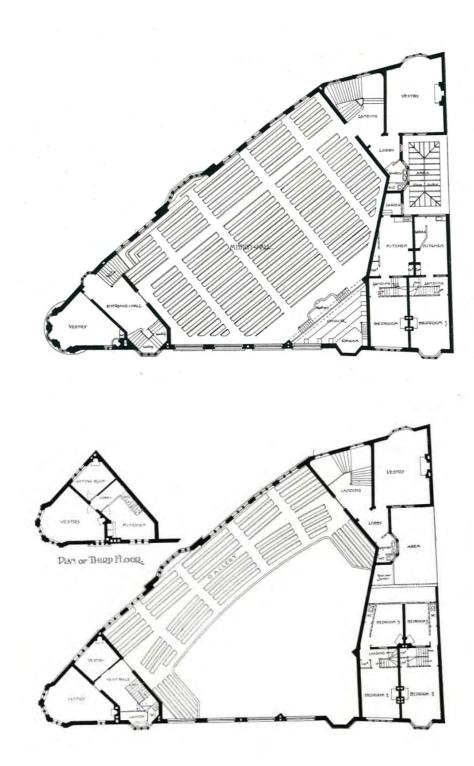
Top to Bottom: First and Second Floor Plans of Westgate Hall in Newcastle by Crouch and Butler. Source: Crouch and Butler (1901).
